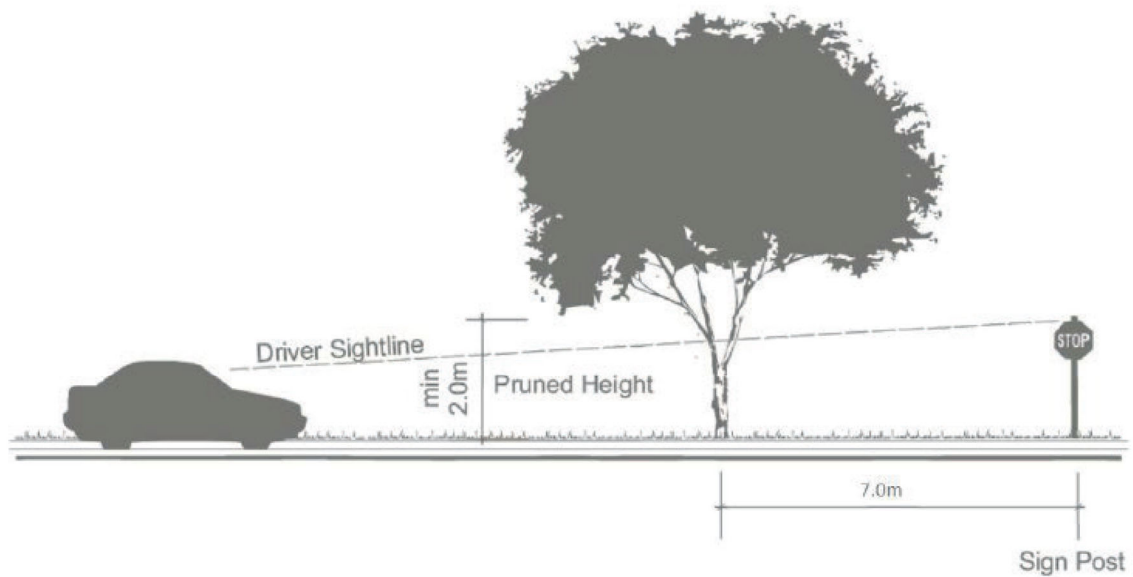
Minimum planting distance from street signs and signals showing drivers sightlines. Low branches pruned on tree to achieve required height.
